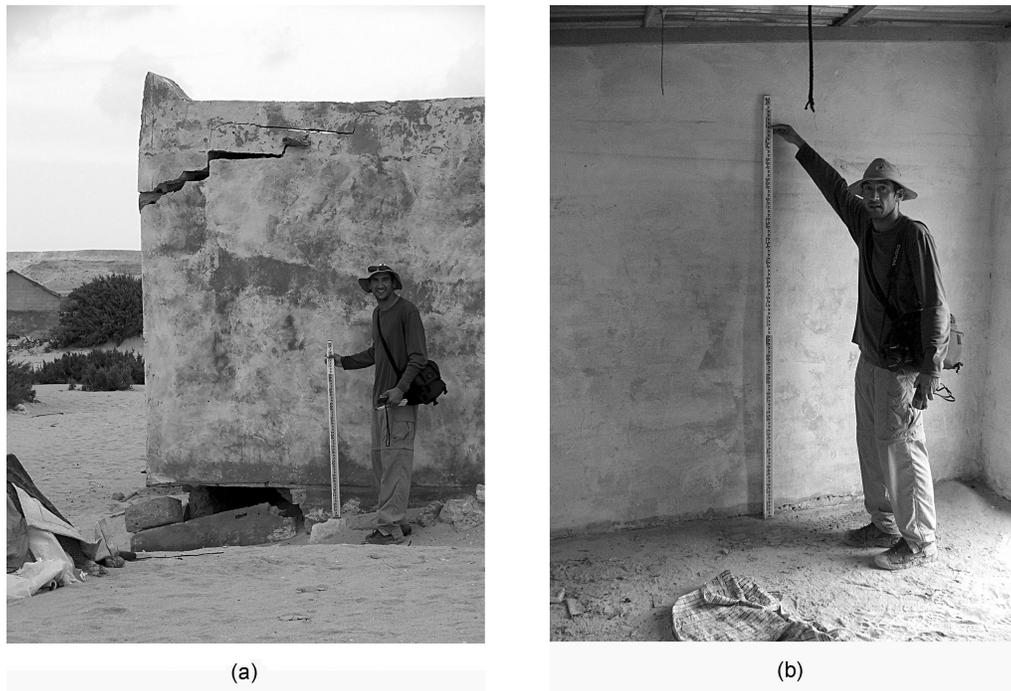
Xaafuun: (a) scour damaged a house corner; (b) a flow depth recording based on a watermark on a house wall.
